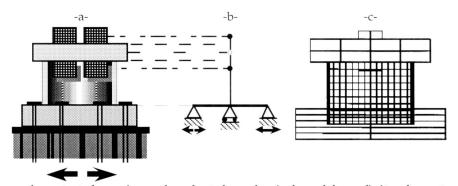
, a- shear tested specimen, b- adopted mechanical model, c- finite element modelling
